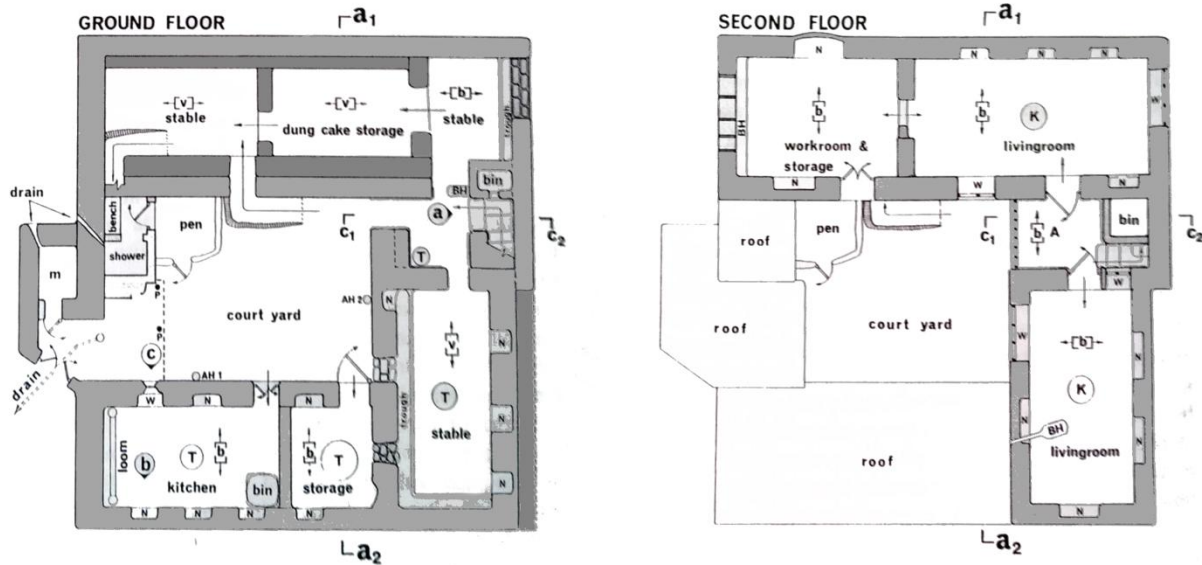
House in Shahabad, Iran. Modifications were made to this house to support a second floor, which it did not originally have. In light grey the original walls, and in dark grey the reinforcements (after Kramer, 1979, p. 148).
